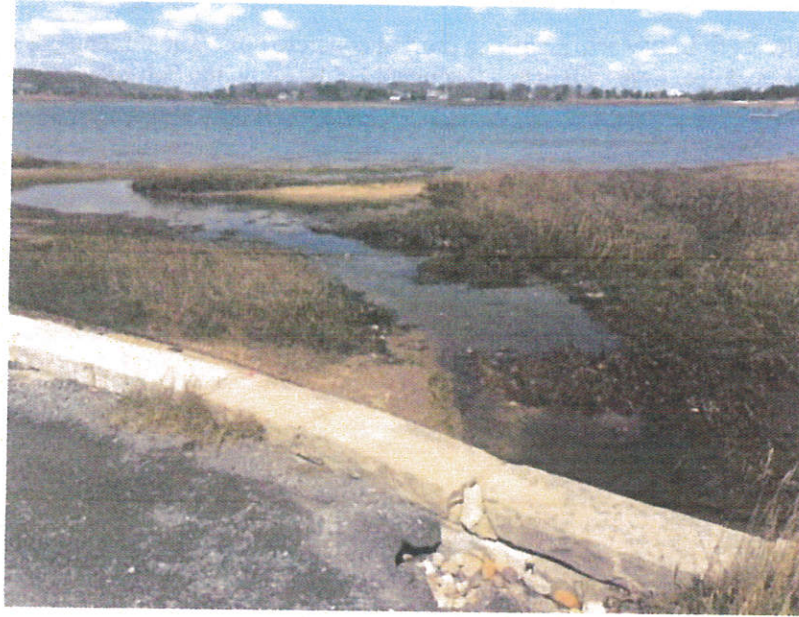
View from Salt Marsh Lane looking at the channel and embayment. Facing north west
